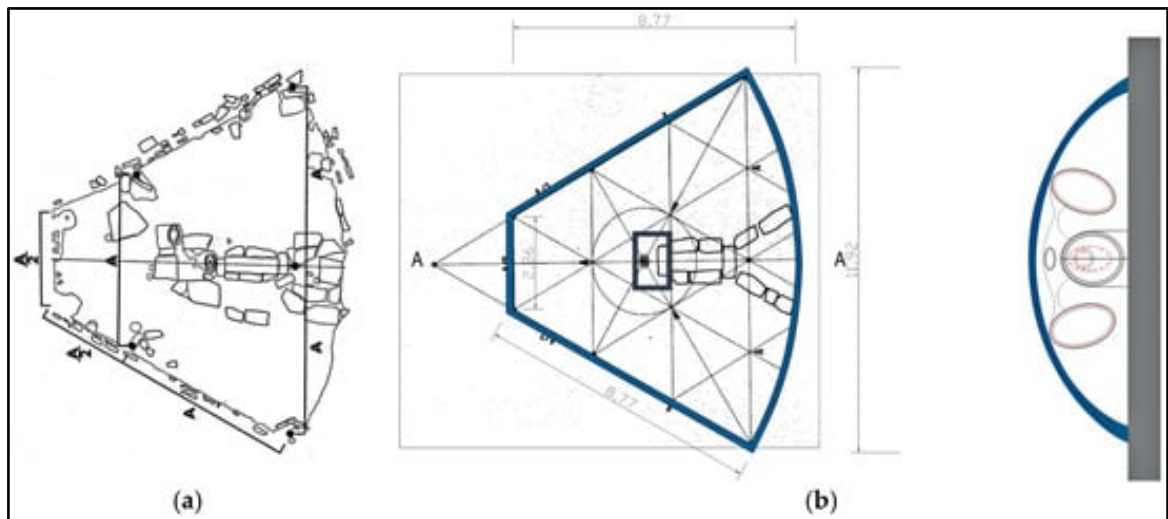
(a) Lepenski Vir Neolithic House: plan; (b) Dobraca Village House plan and section [13].
